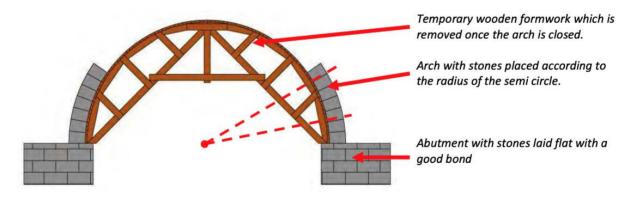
temporary wooden formwork (BTC uganda, 2013)
